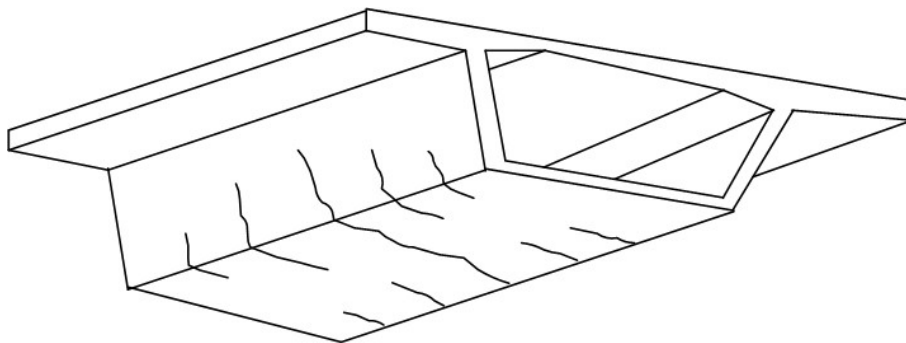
Box Girder Cracks Induced by Flexure (Positive Moment)
